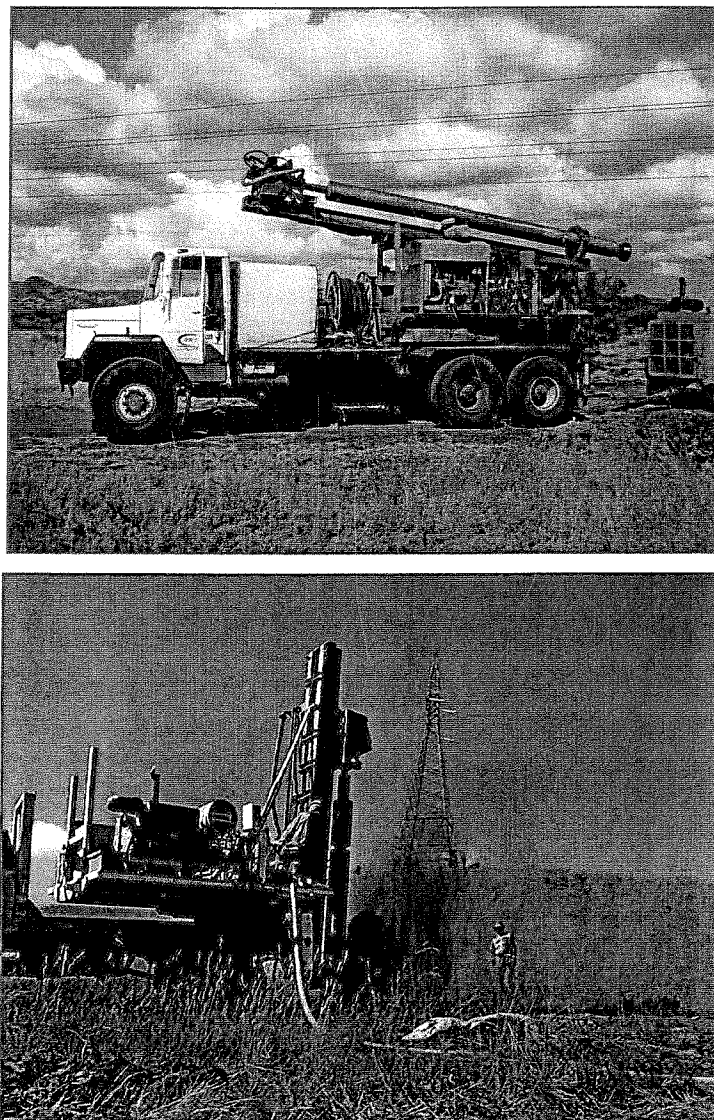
Drilling rig and generator (top) and excavation activities (bottom)
